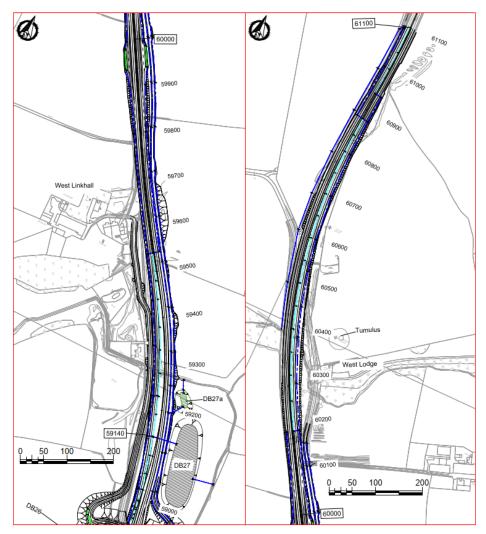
Highway Drainage Layout and Detention Basin DB27 and DB27a PRELIMINARY DESIGN STRATEGY:
